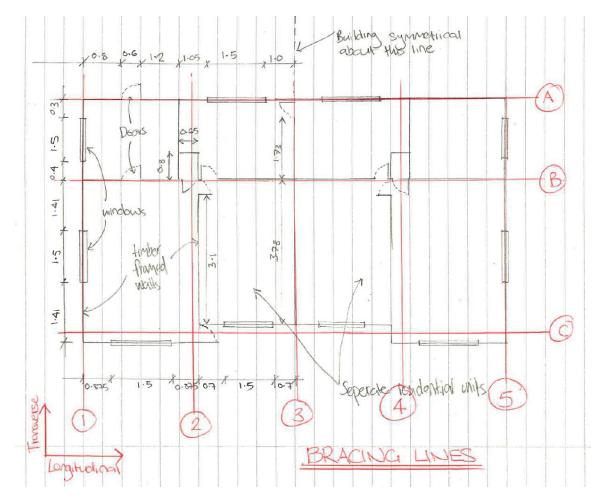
Longitudinal and transverse wall bracing lines for Blocks A to F
